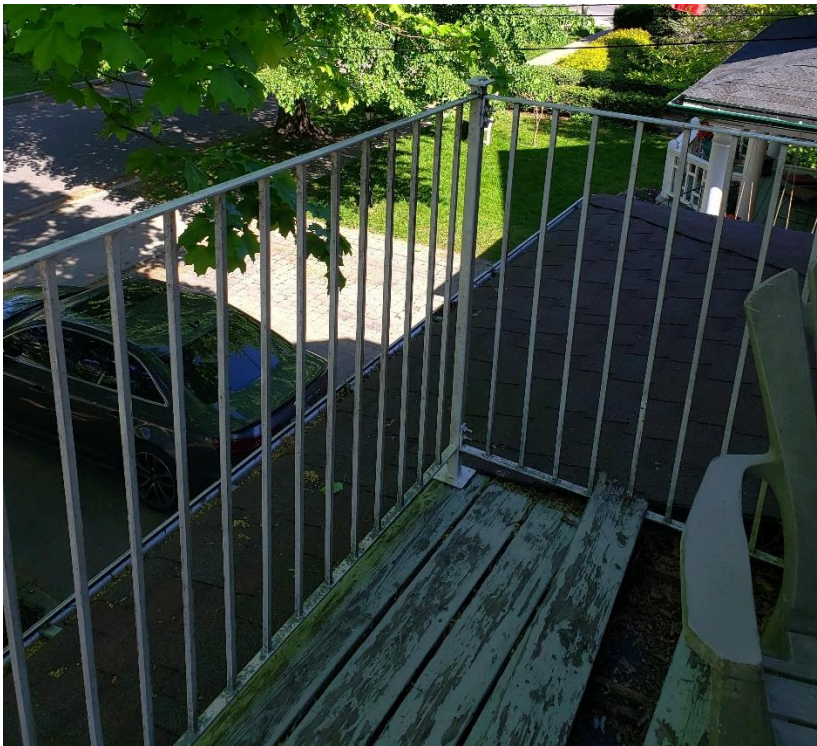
Existing railing of the second floor terrace/balcony. Notice the rotting floor boards as well.
